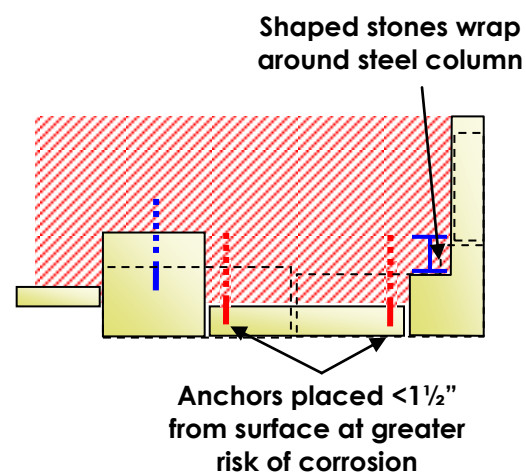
B: SCHEMATIC PLAN SECTION B-B
